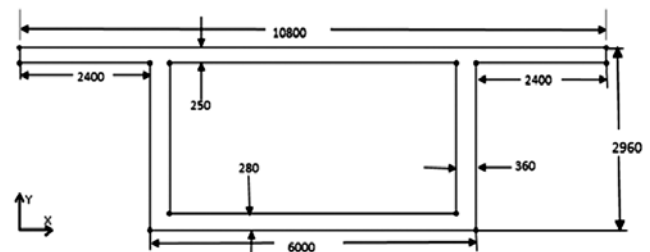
Cross section of box-girder bridge (dimensions are in mm).
